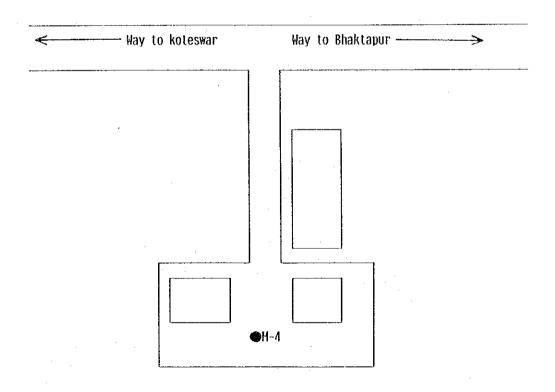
Location plan of borehole M4 at proposed Training Center, Sanothimi
